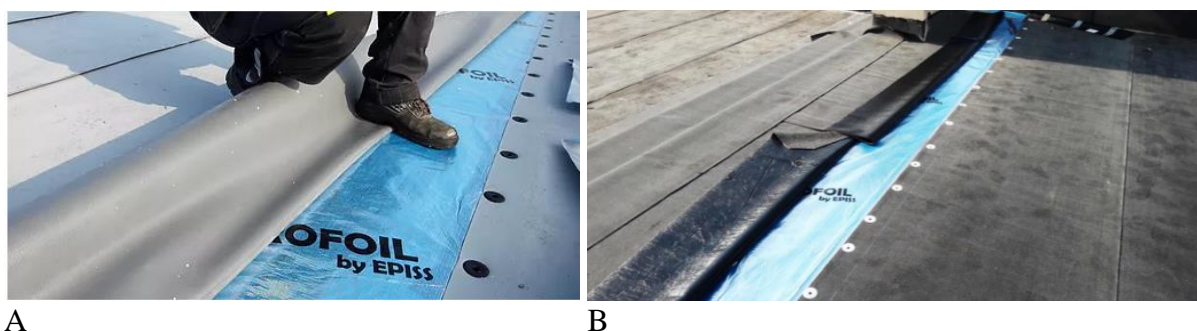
Application of conductive detection foil under waterproofing. A - waterproofing from PVC-P, B - waterproofing from bitumen sheets [9].
